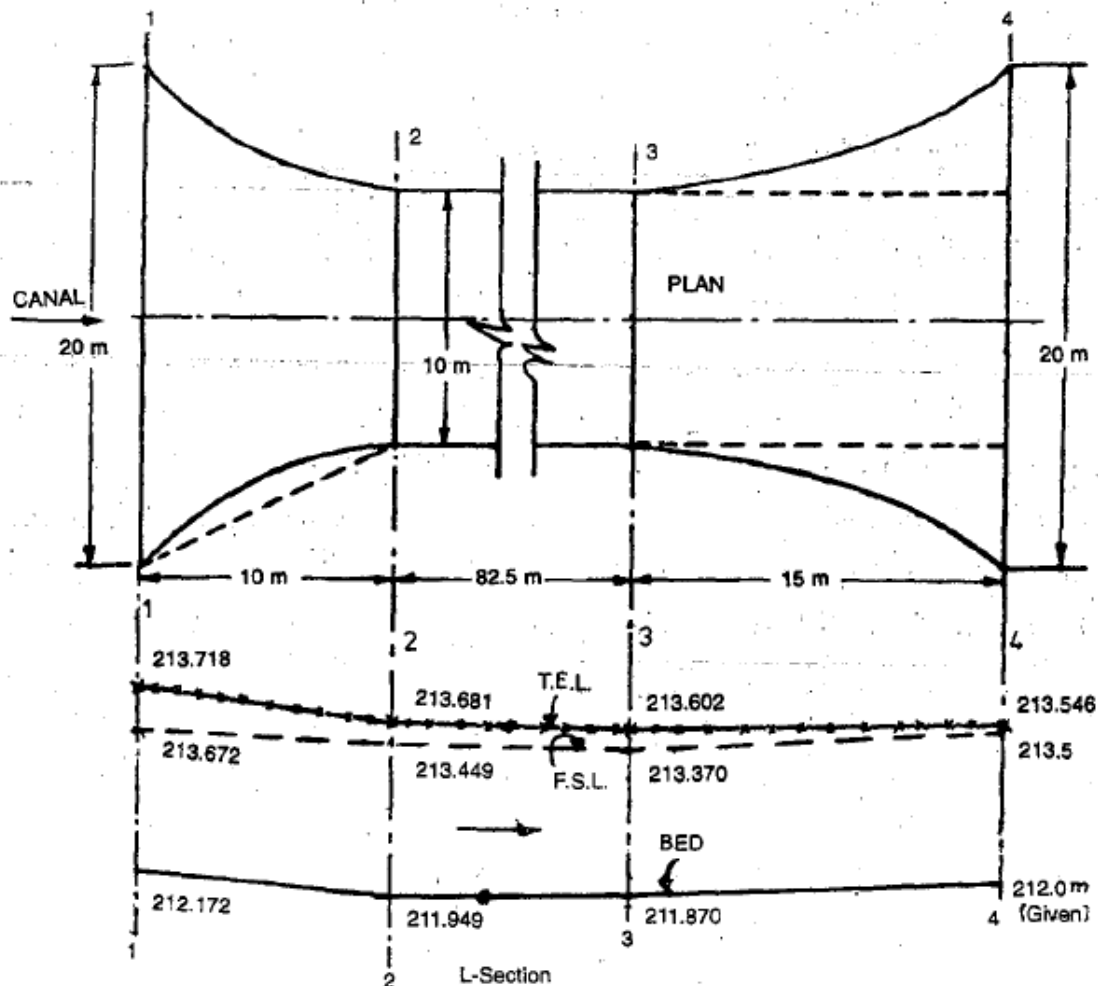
Plan and Section of Canal Trough in Example 14.1.
